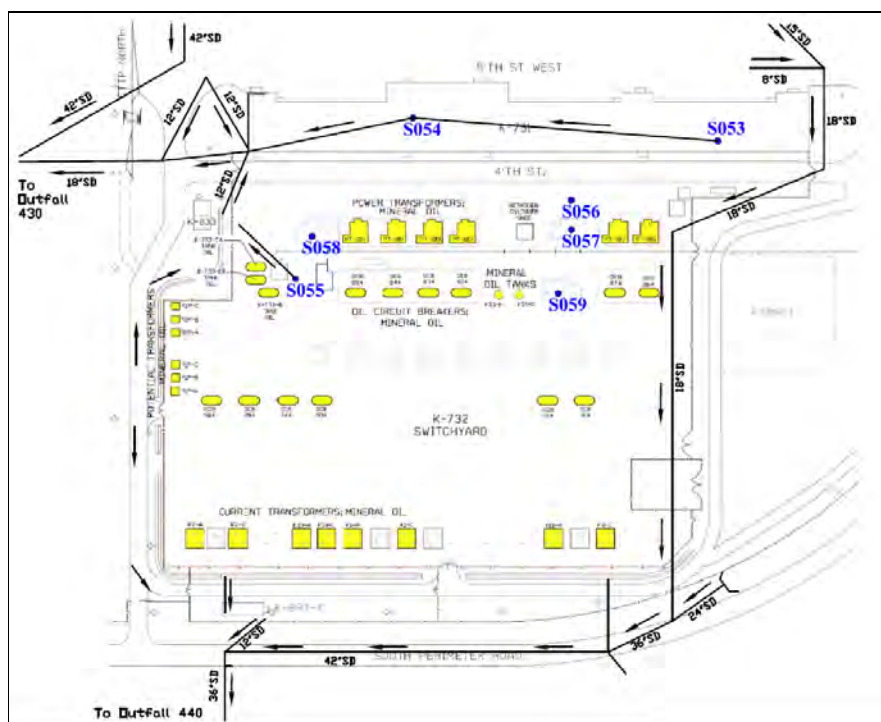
K-731 Switchhouse and K-732 Switchyard draining system.
